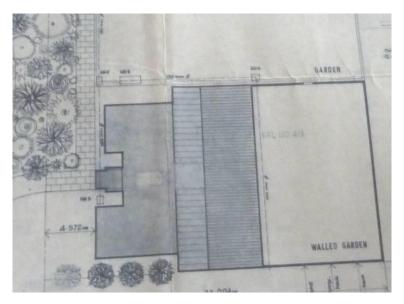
Block plan dated 1971 by Bartlett & Gray (Nottingham meeting house collection).
